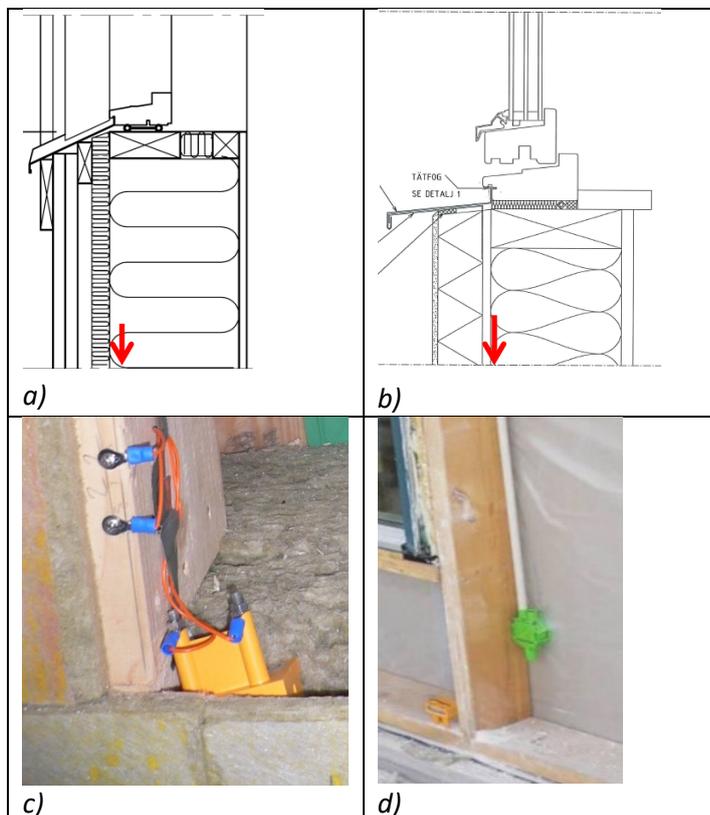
Vertical cross-section of external walls (a–b) with part of window-wall interface. The outdoor area is to the left. The red arrows show the studied positions. Photo (c) shows the position of a sensor in a residential building of seven-storey height. Photo (d) shows the position of a sensor in a residential building of two-storey height.
